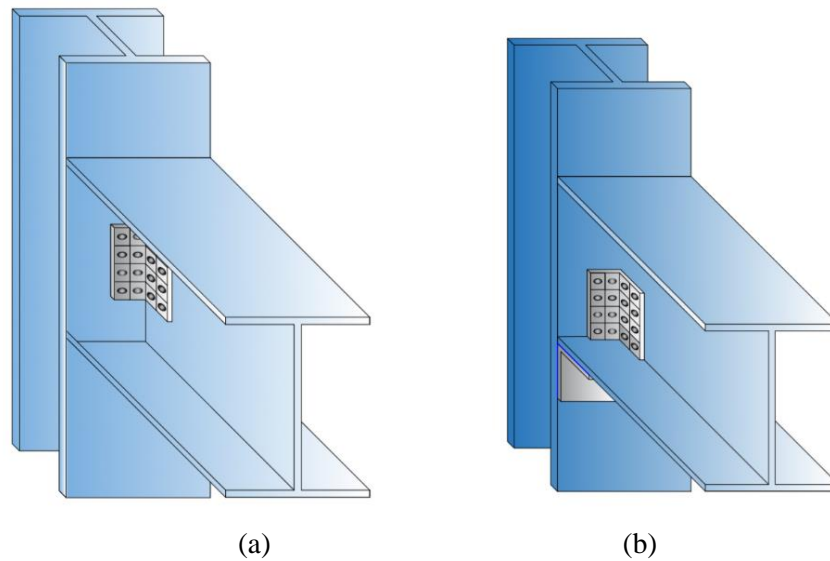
Connection types (a) Single plate shear connection (b) Welded angle seat connection
